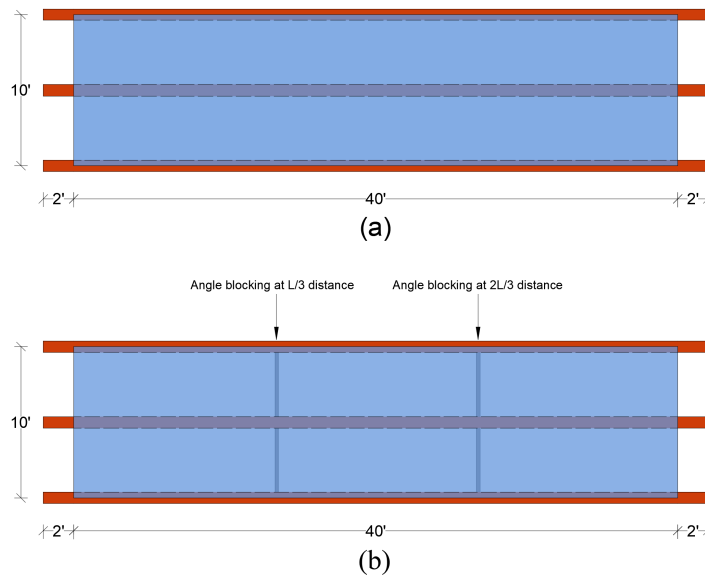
Layout of a typical 10 ft $\times$ 40 ft single FastFloor module tested in this study. (a) Unbraced configuration, showing the beams without bracing. (b) Braced configuration, featuring angle blocking members installed at $L/3$ and $2L/3$ distances on the beam's bottom flanges.
